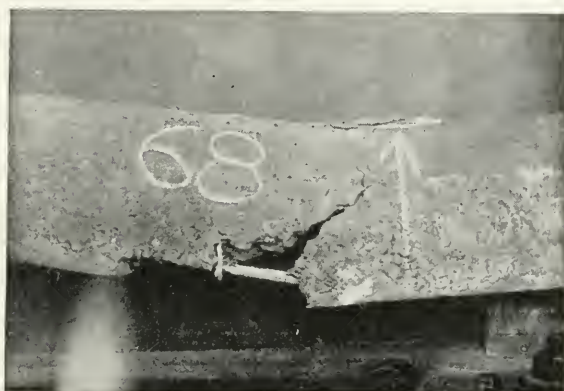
VIEWS SHOWING BEAMS AFTER FAILURE.
